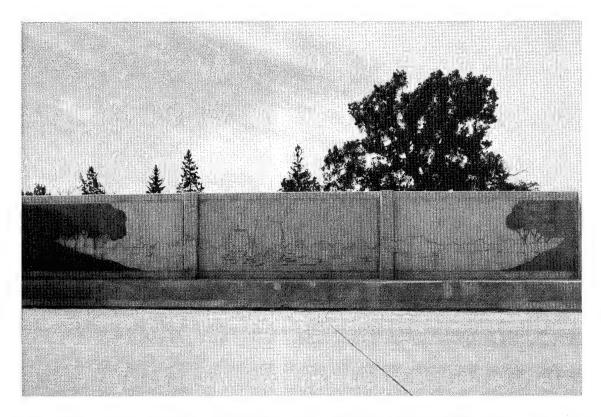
Precast concrete noise barrier with murals, Winnipeg, Canada (from Ulyatt and Winch 1992)
